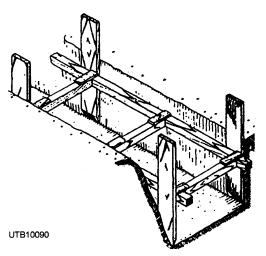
Position of walers before placing sheetpiling for shoring trenches.
